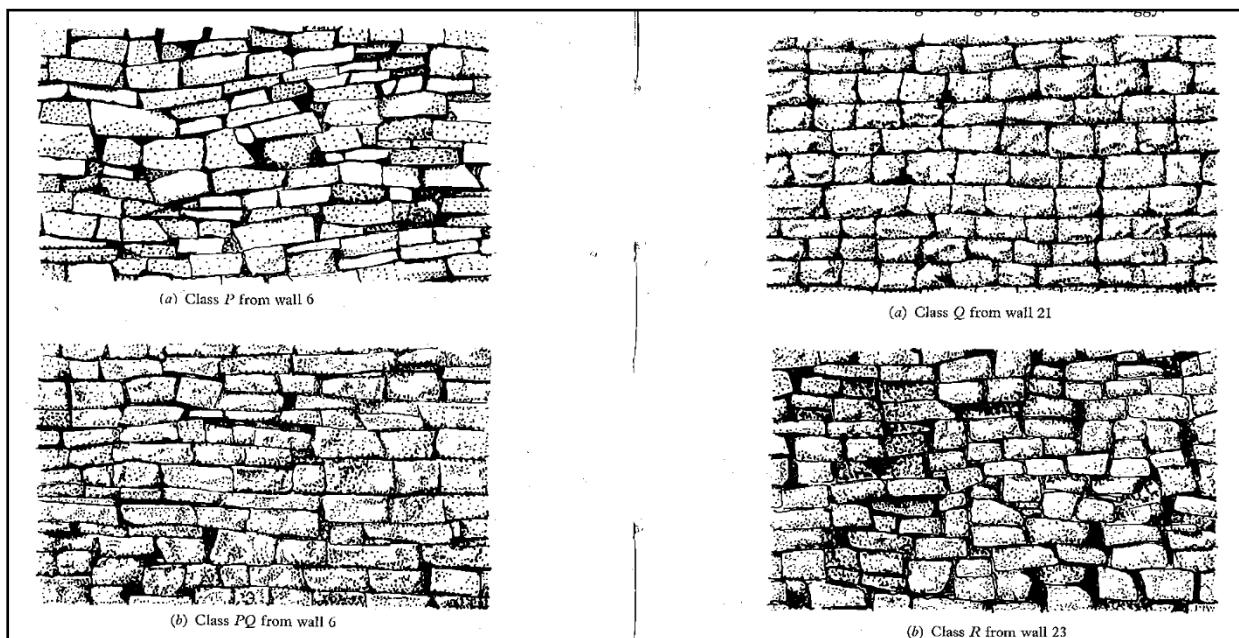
3: Walling styles developed by Anthony Whitty (Summers *et al.* 1961: 292-293)
